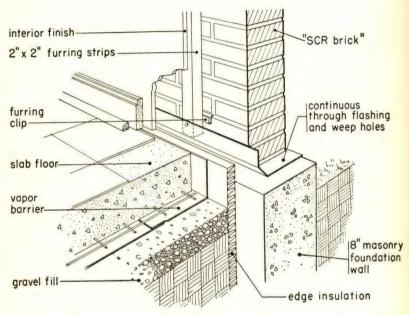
Foundation Details with Slab-on-the-Ground Construction Courtesy of Structural Clay Products Institute
